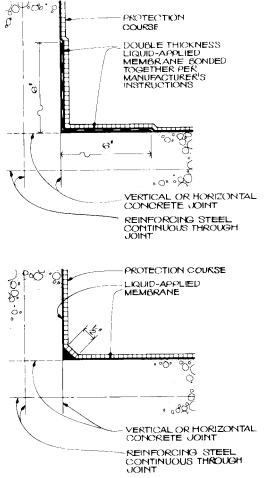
Turnup Details at Reinforced Joint (see 17.6)
